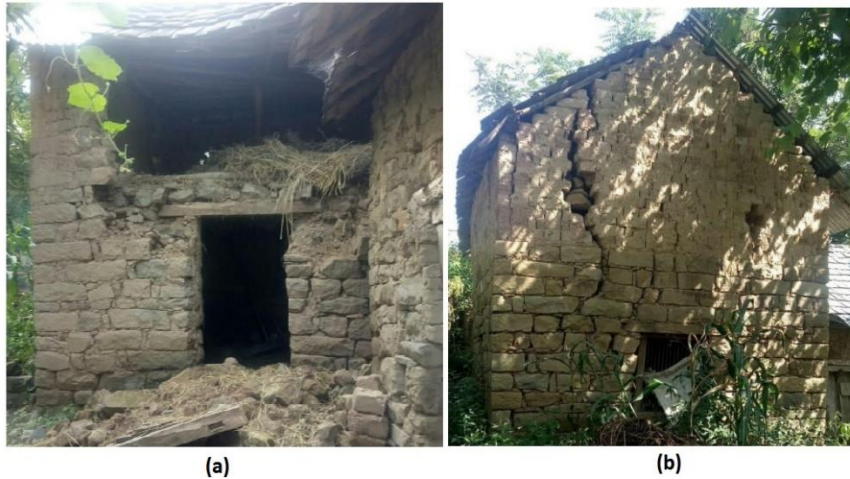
a Out of plane failure of wall, b development of cracks from openings
